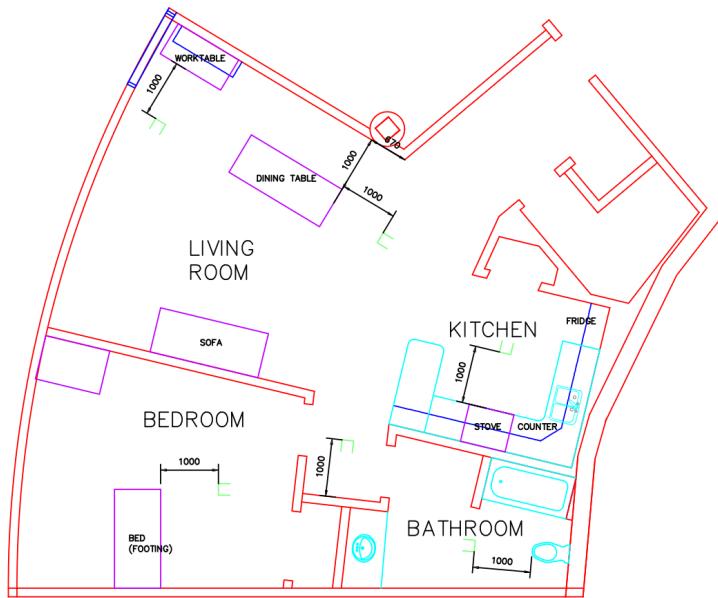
Floor plan of the ILS. Positions where the participant stood 1 meter from appliances or furniture are marked in the green "open" box on the floorplan.
